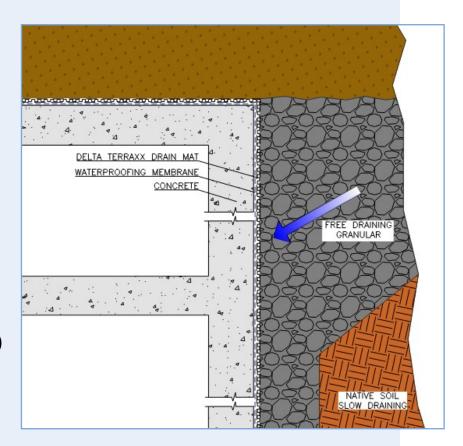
Positive Side Foundation Wall Waterproofing
